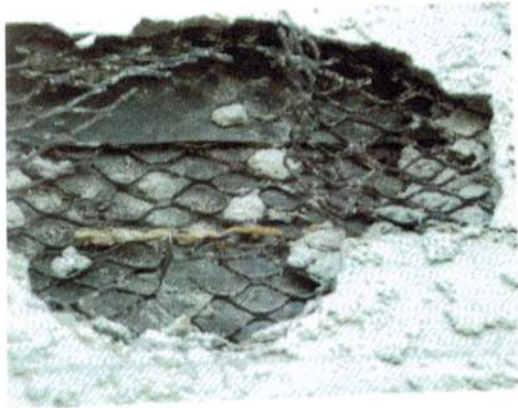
Destructive inspection showing improperly lapped paper-backed lath at a horizontal crack.
